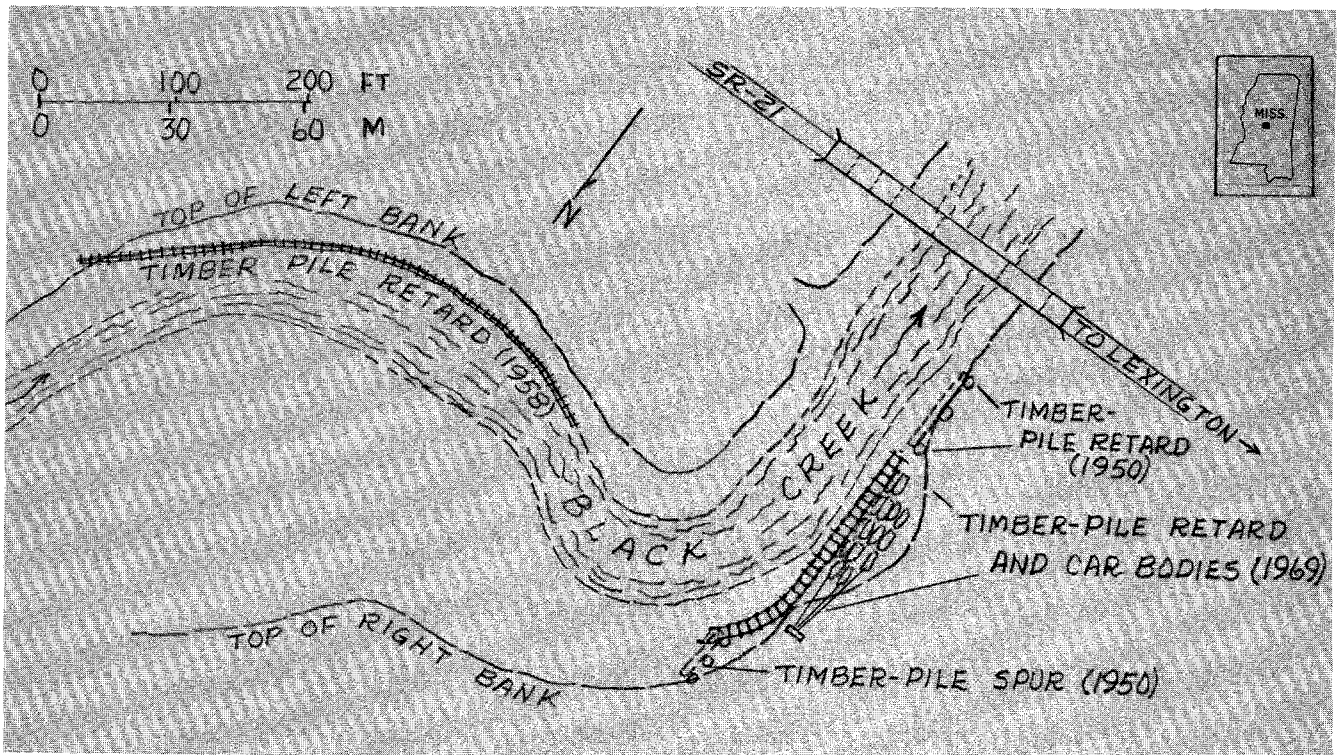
Plan sketch showing countermeasures at SR-12 crossing at Lexington, Miss.
